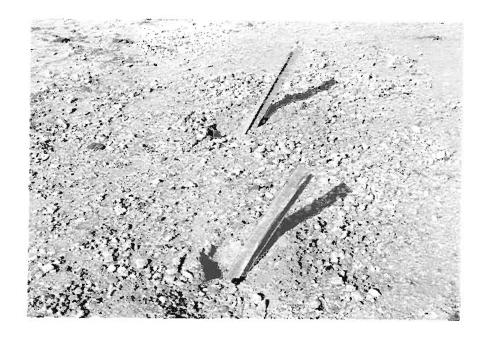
Dual 3-lb sign support installation anchored in strong soil after test 405231-18.
